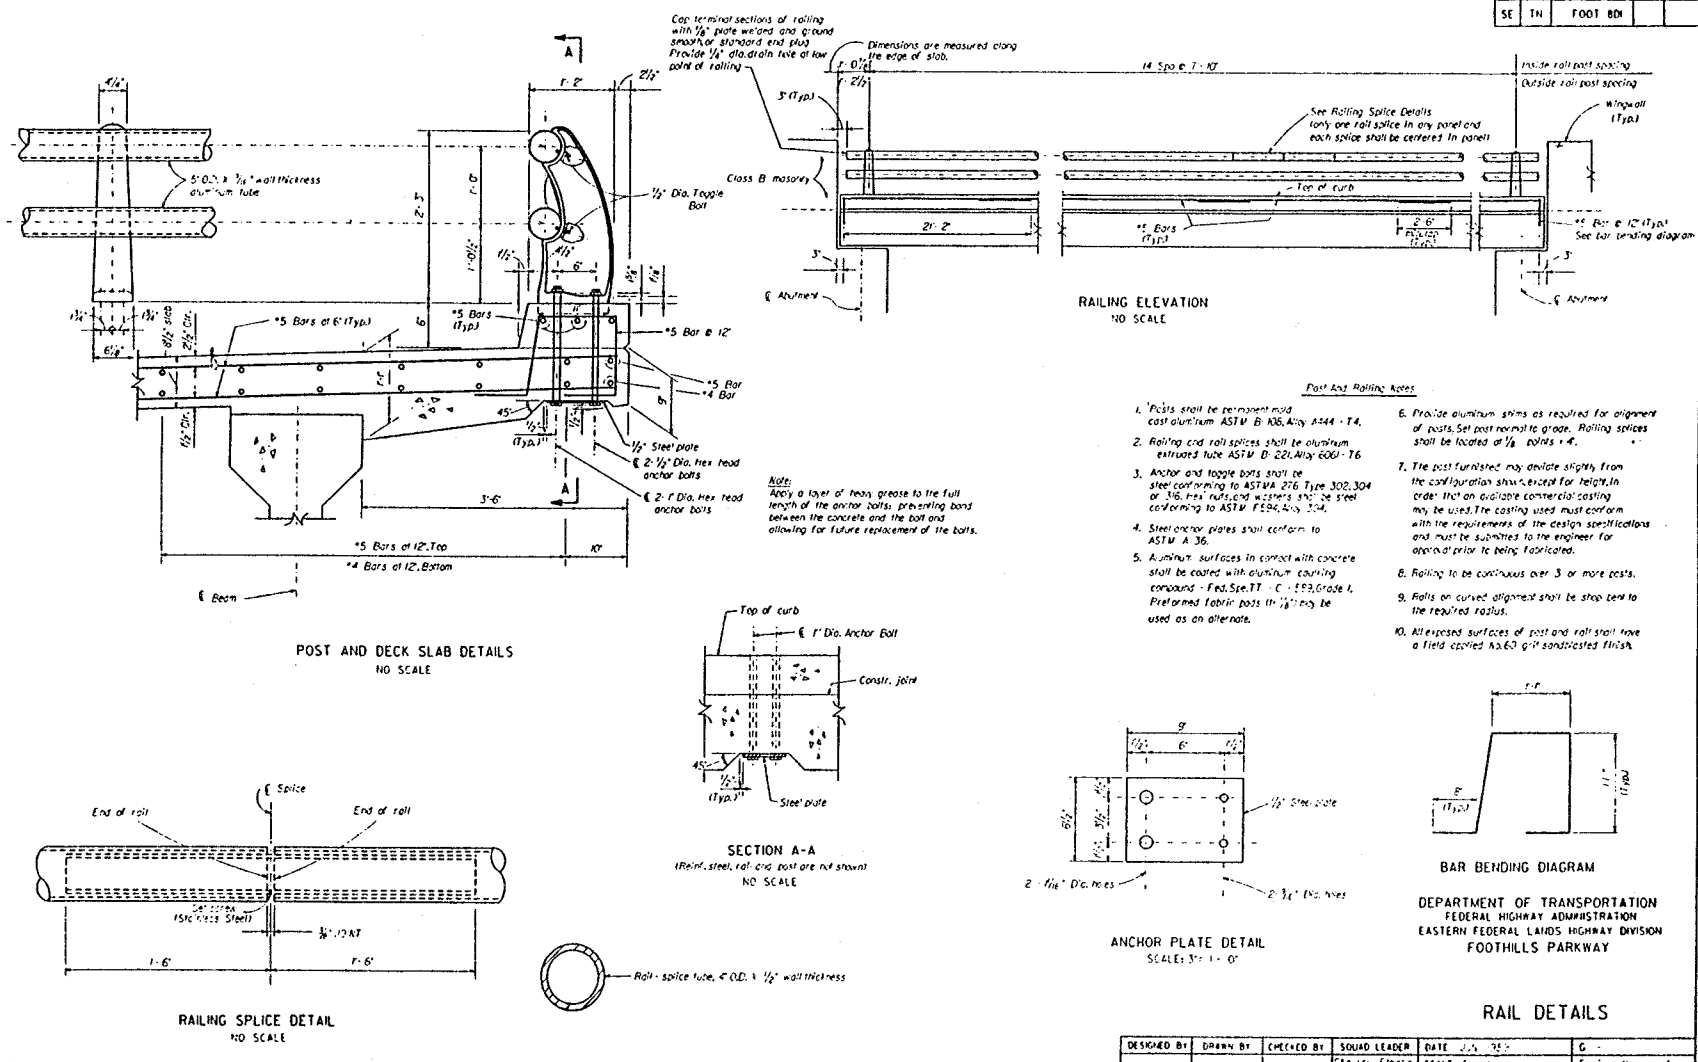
Foothills Parkway Aluminum Bridge Rail (19,20).
